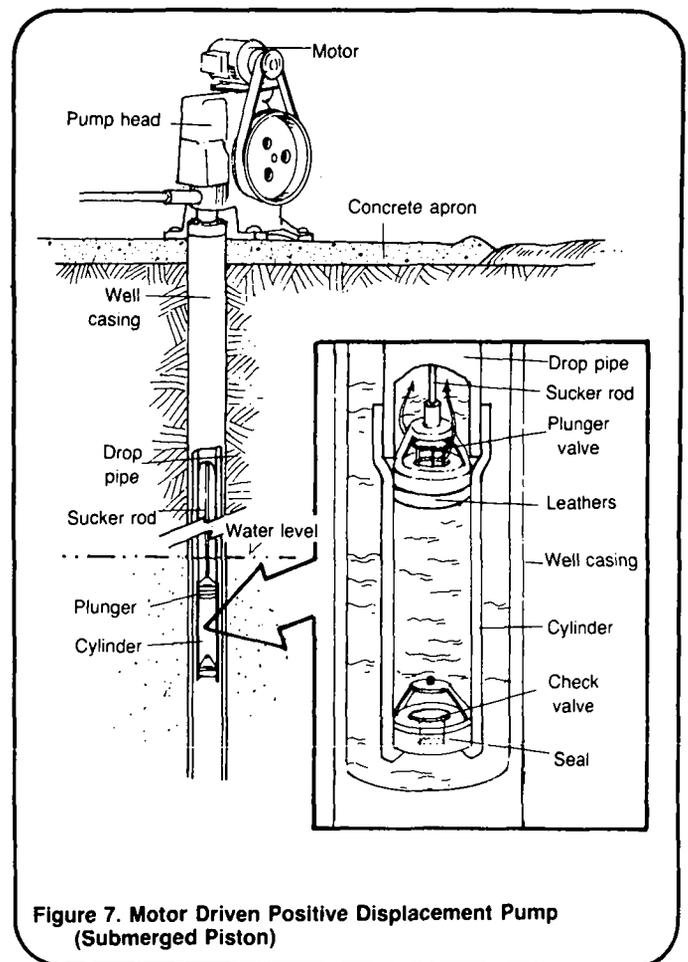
Motor Driven Positive Displacement Pump (Submerged Piston)
